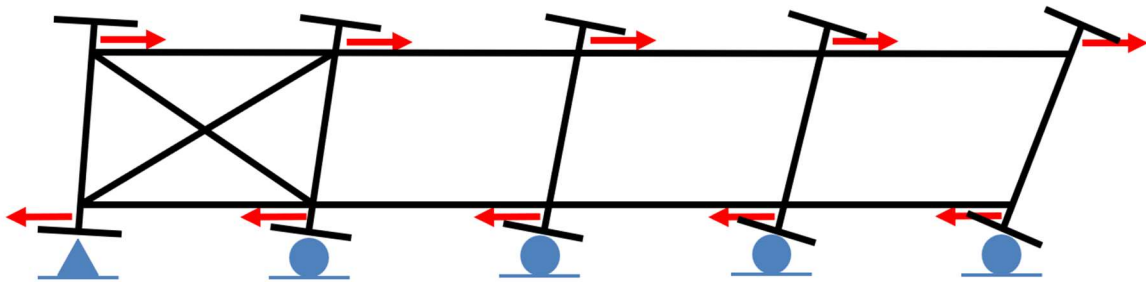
Bridge Cross-Frame Line Displacement with Supports Under Each Girder
